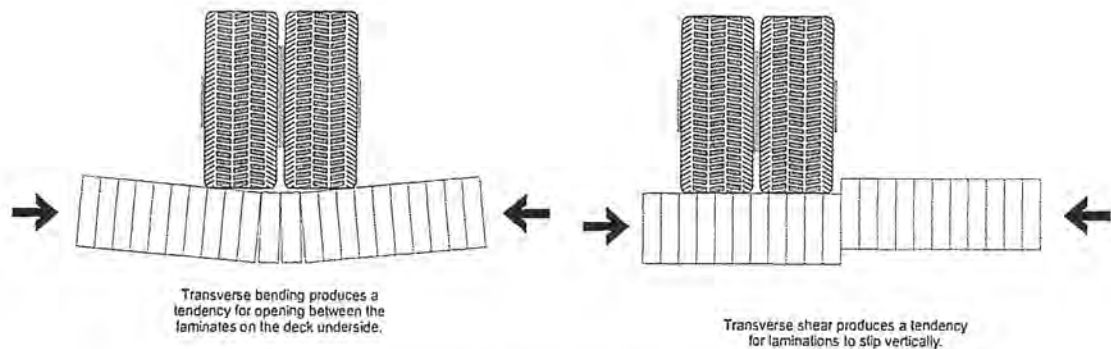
Structural Actions of a Stress Laminated Timber Plate Bridge deck
